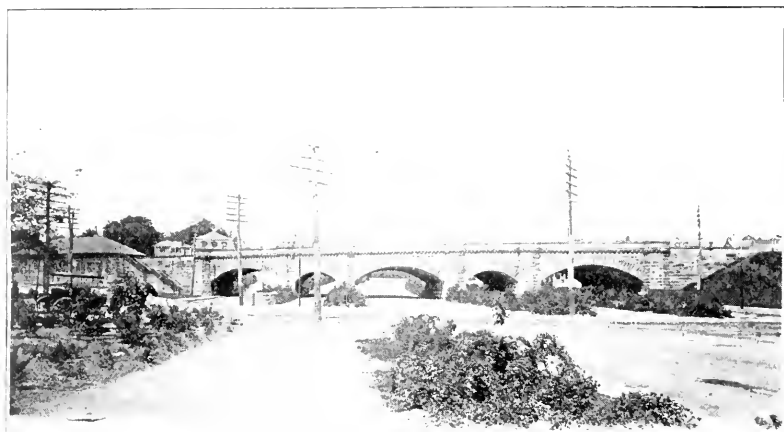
COMPLETED PARKWAY AND MORTON STREET ARCH VIADUCT.
